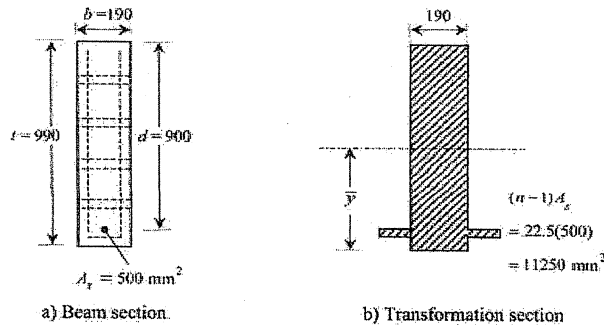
Cross-Section of the Beam of Example 3-12.
